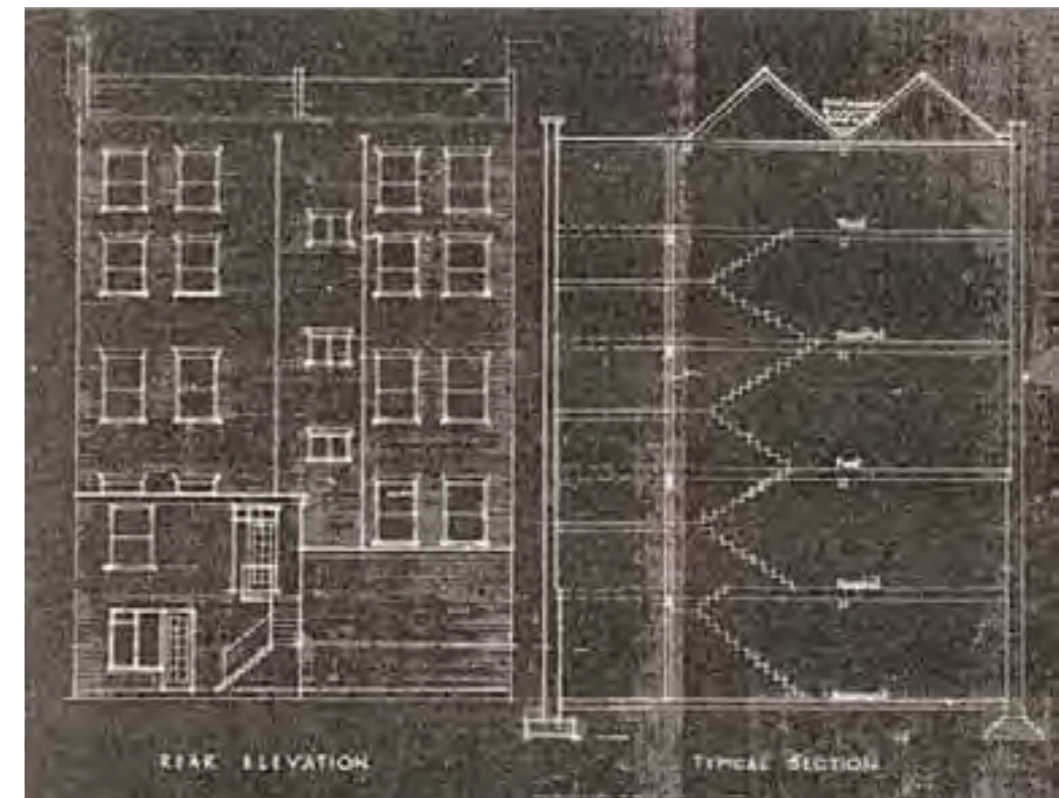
APRIL 1965 DRAWING FOR NOS. 14 AND 15 GREAT JAMES STREET, REAR ELEVATION AND TYPICAL SECTION B (SOURCE: CAMDEN LOCAL STUDIES LIBRARY AND ARCHIVE).
